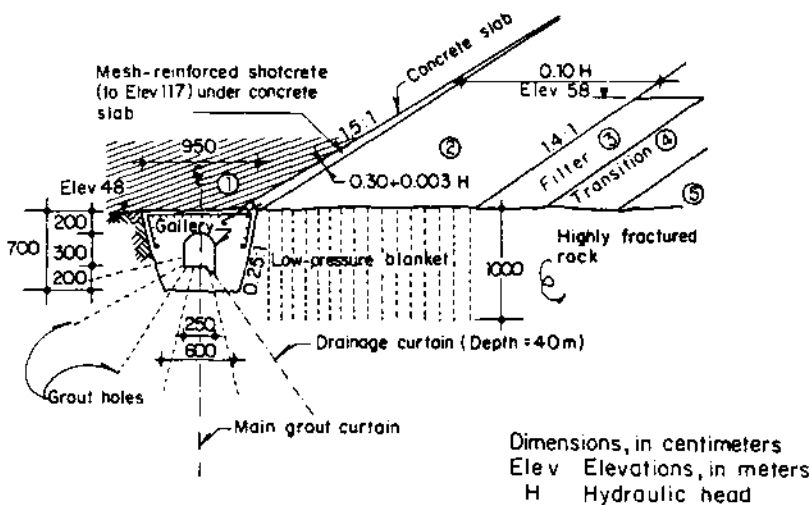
Proposed grouting and drainage gallery, Aquamilpa Dam (Moreno 1987).
